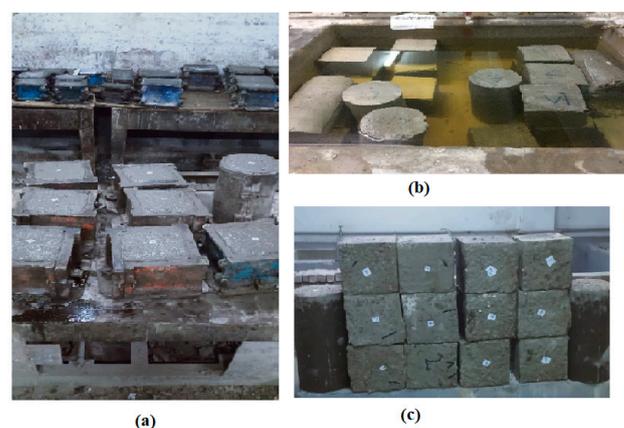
Steps of mixing and curing: (a) molding concrete samples; (b) Samples in curing tank; (c) de-molding concrete samples.
